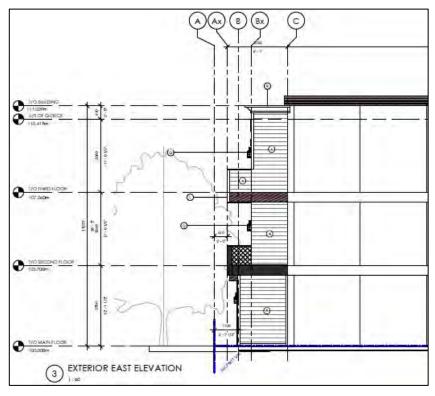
Partial East Elevation of building. Note – Line A (blue) is the property line
